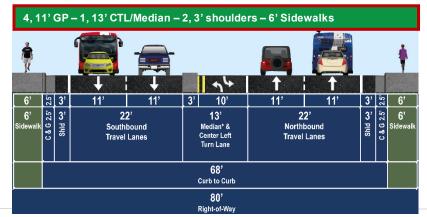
Short-Term Recommended Cross Section: Route 66 to Beaver Street
